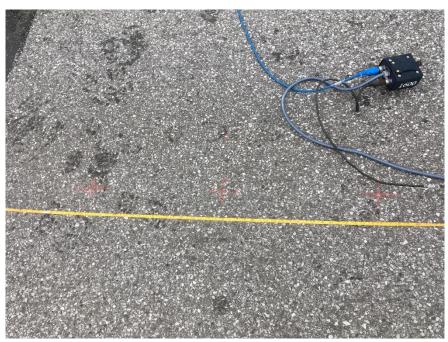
Area 3 GPR Scanning Layout on Bridge 77.
